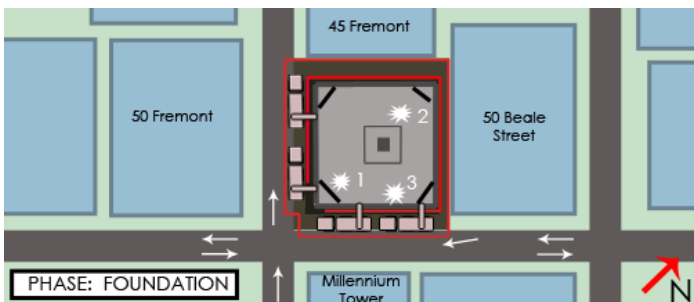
The building's foundation is composed primarily of a mat slab, which spans the base of the building and is 5 feet deep.
